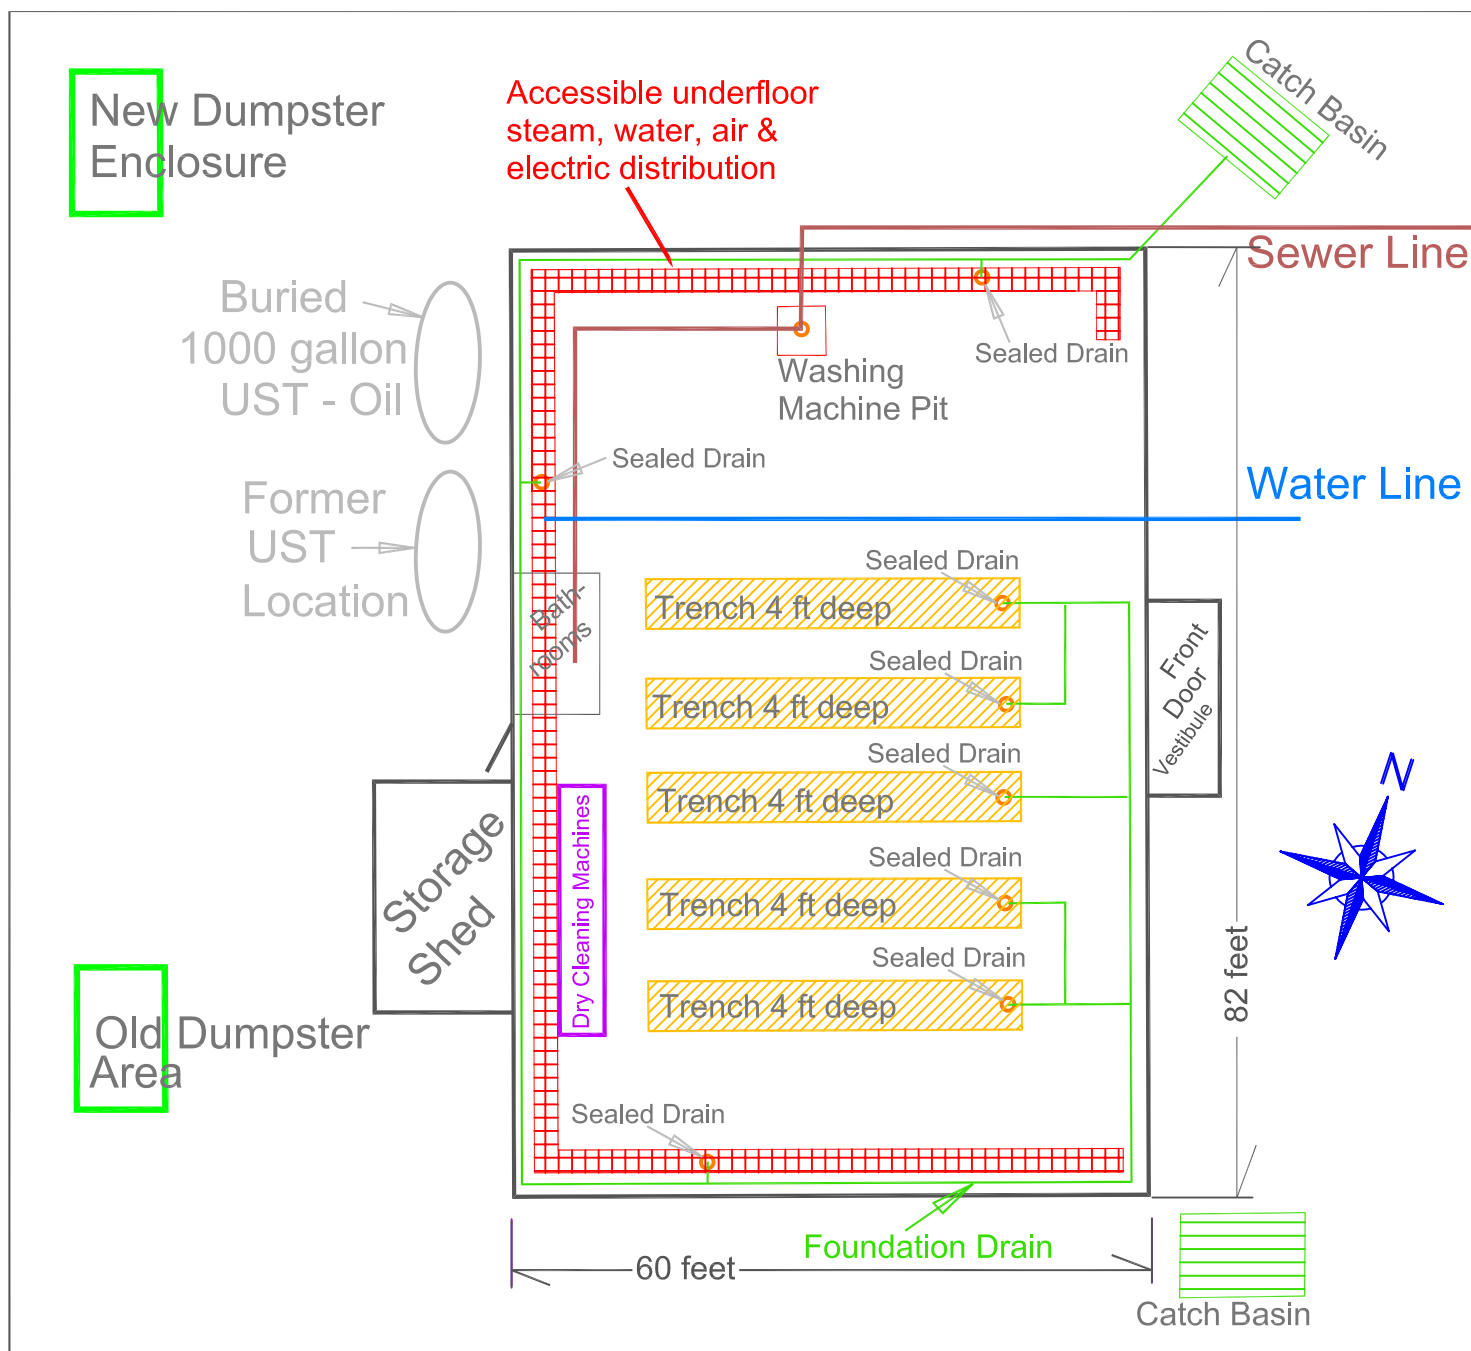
Site Plan of Building, Utilities, & Special Features Constructed for Dry-Cleaning Operations
